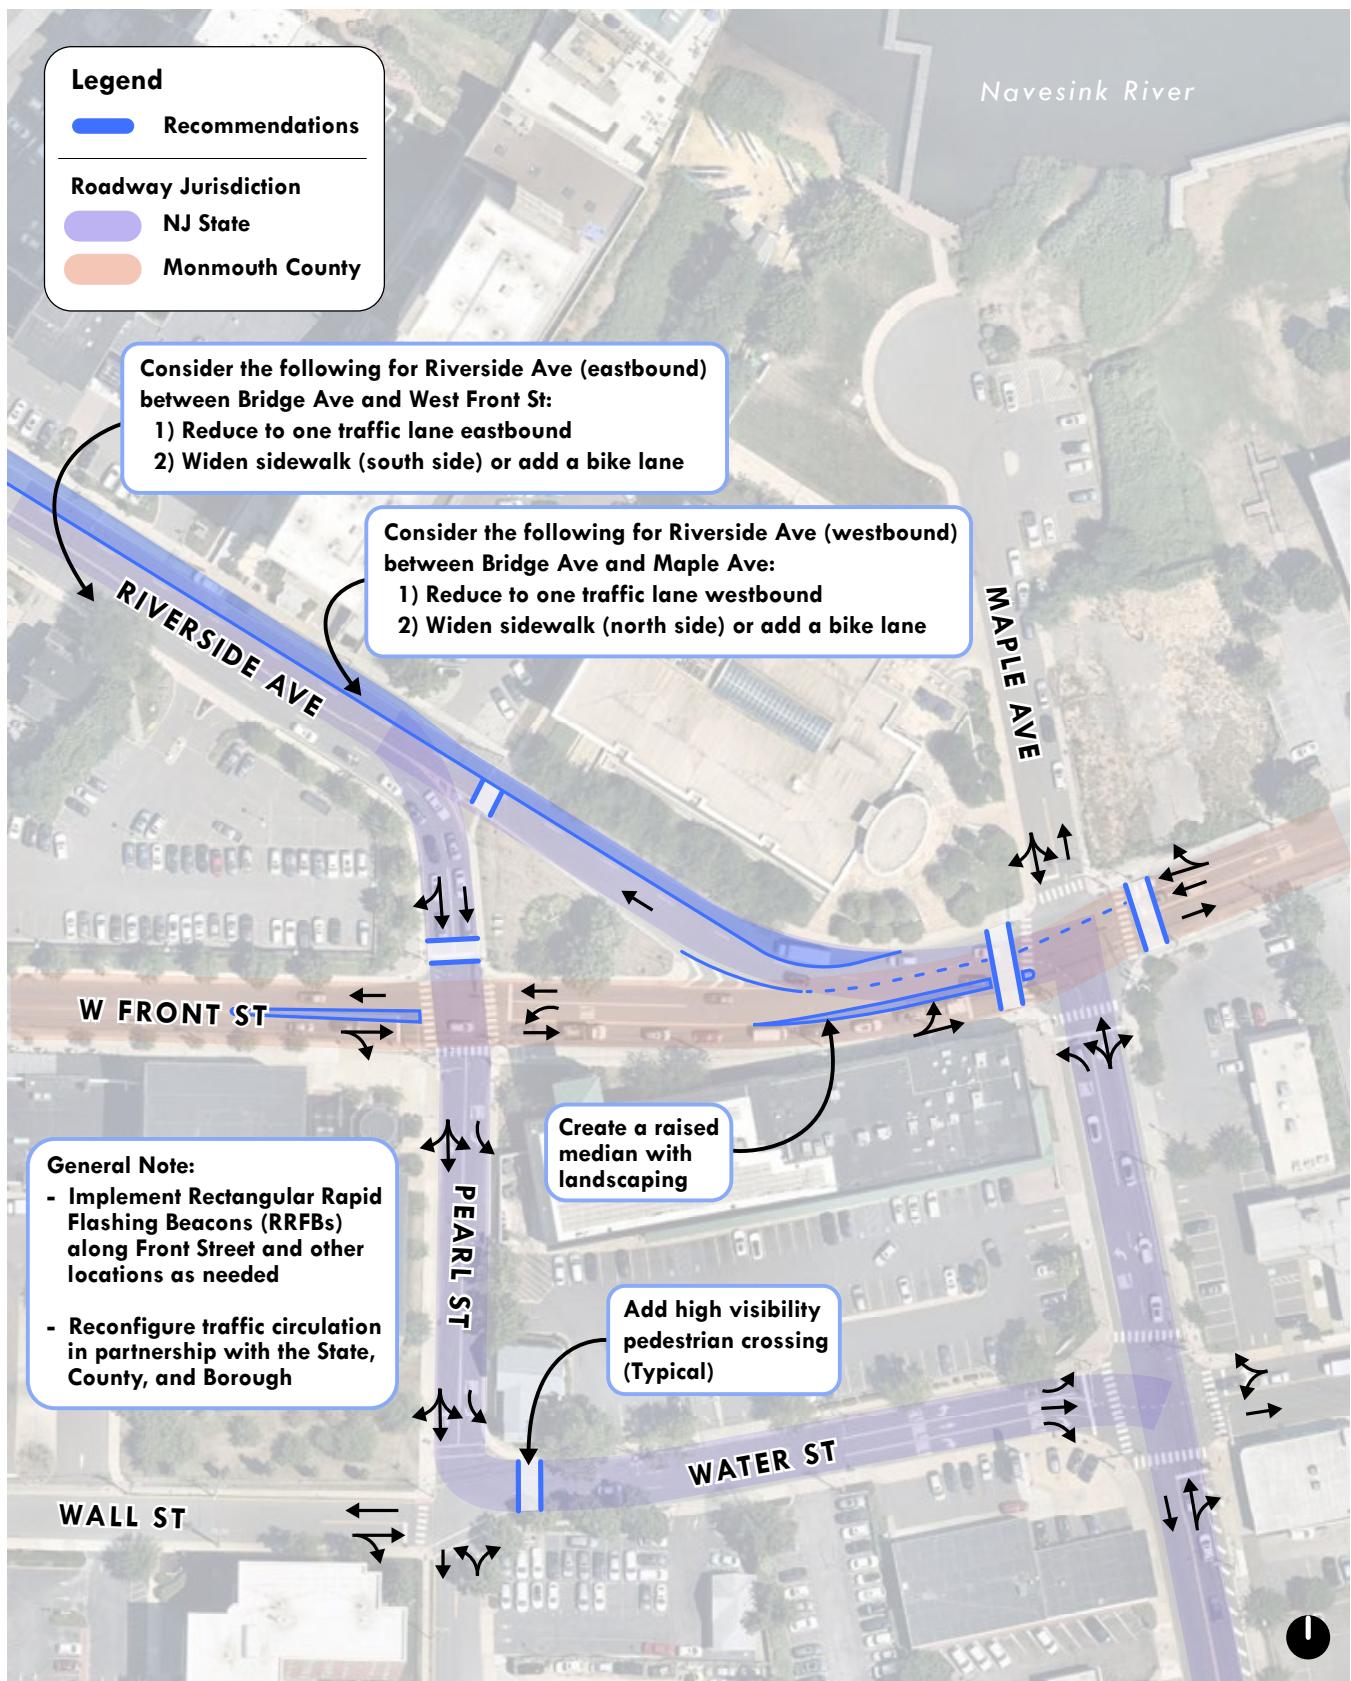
Conceptual Plan for the Intersection at West Front Street/Riverside Avenue/Maple Avenue
